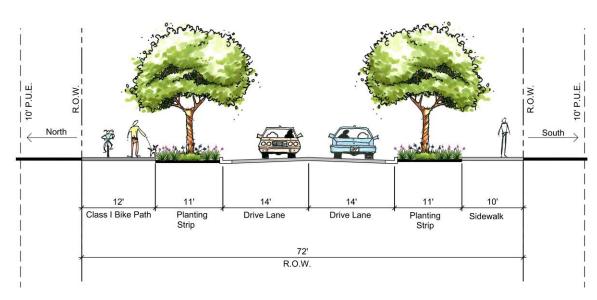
Street 'B1' - Wawona Street - Section
